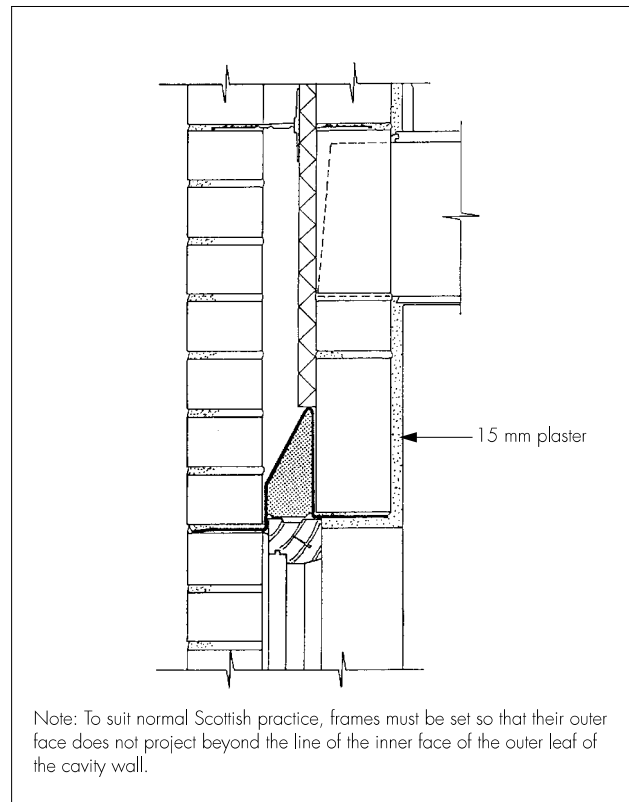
Typical installation details for Cougar flush lintels (types CG)
